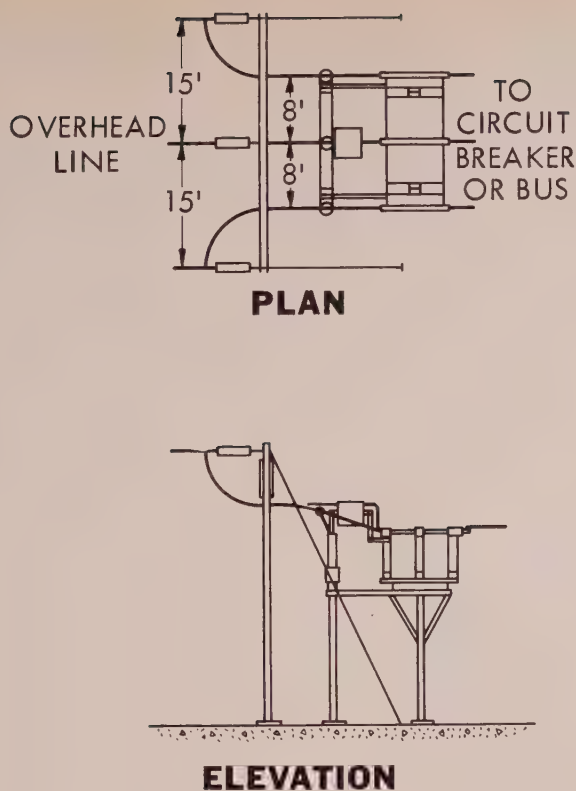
When available space limits unit-type design, a standard, reduced-bay design is used.
